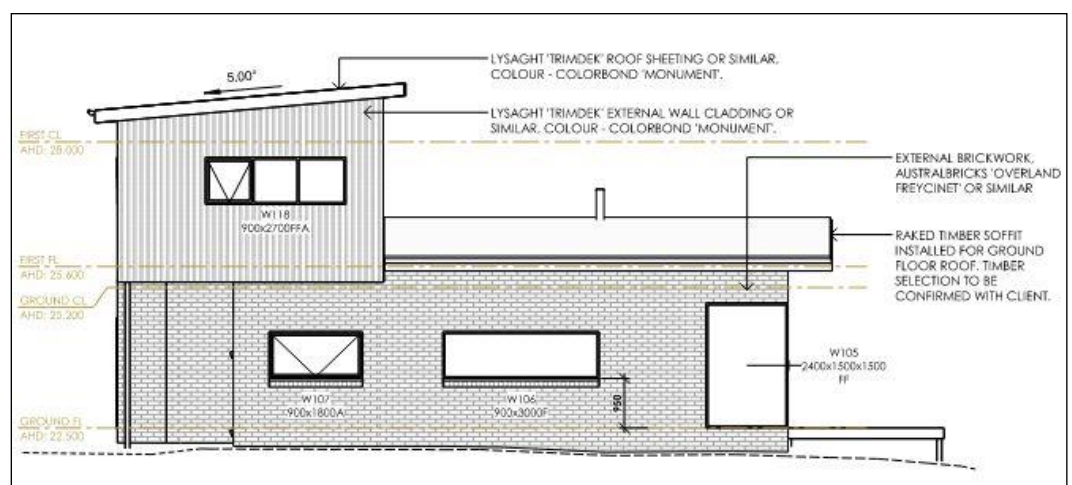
Elevation of the main dwelling facing the eastern side boundary.
